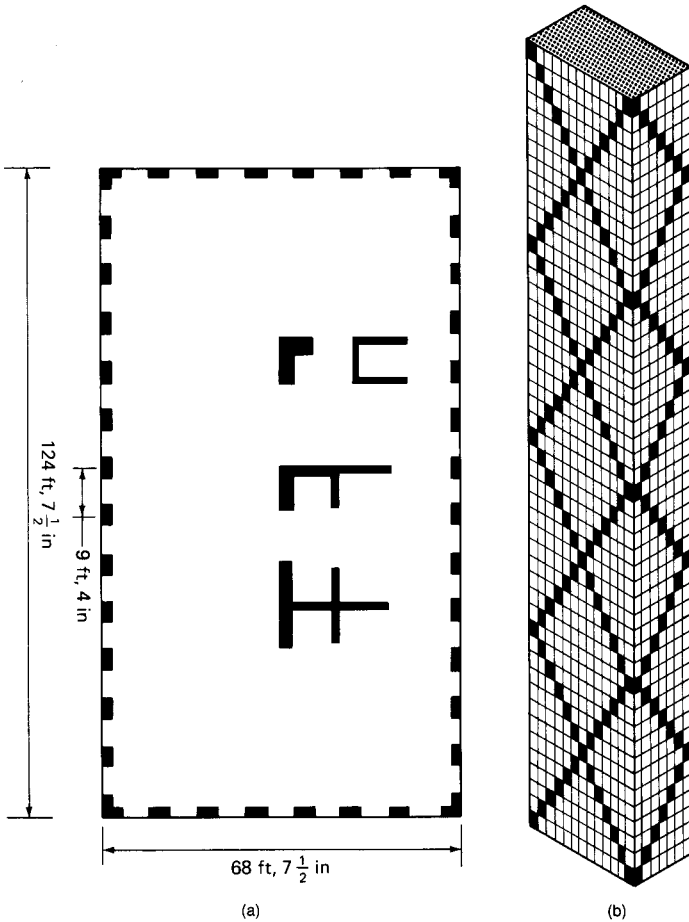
Exterior braced tube. (a) Plan; (b) schematic elevation. (Architects, Skidmore, Owings and Merrill; engineers, Robert Rosenwasser Associates.)
